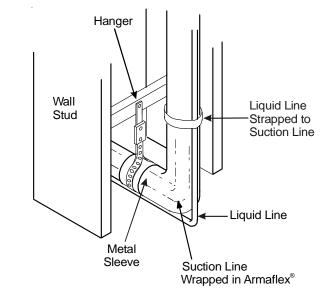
Installation of Refrigeration Piping From Vertical to Horizontal
